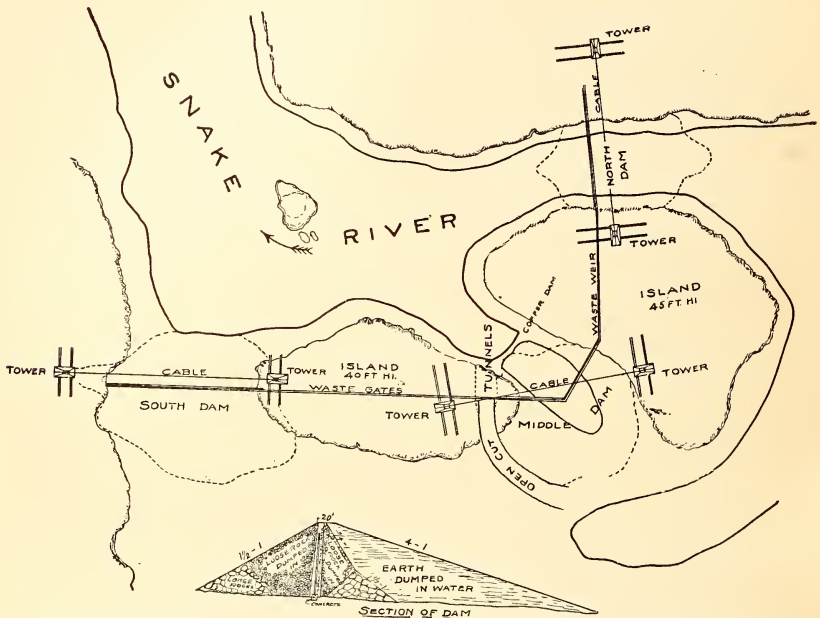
Plan and section of Milner Dam, Twin Falls project, Snake River, Idaho.
